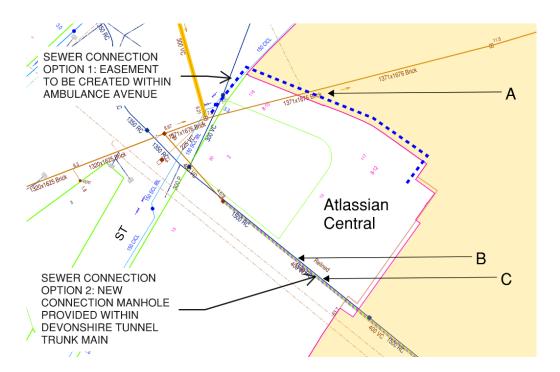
Existing Sewer(A, C) and Stormwater (B) Mains Connection
